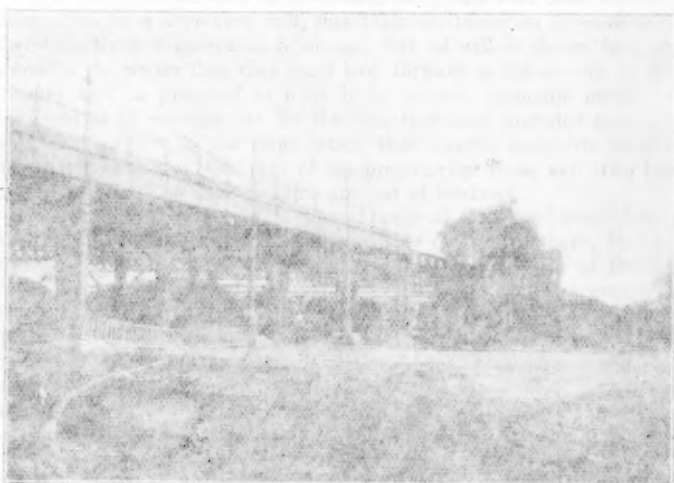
GRAND TRUNK RAILWAY, LOOKING NORTH ALONG THE BRIDGE.
